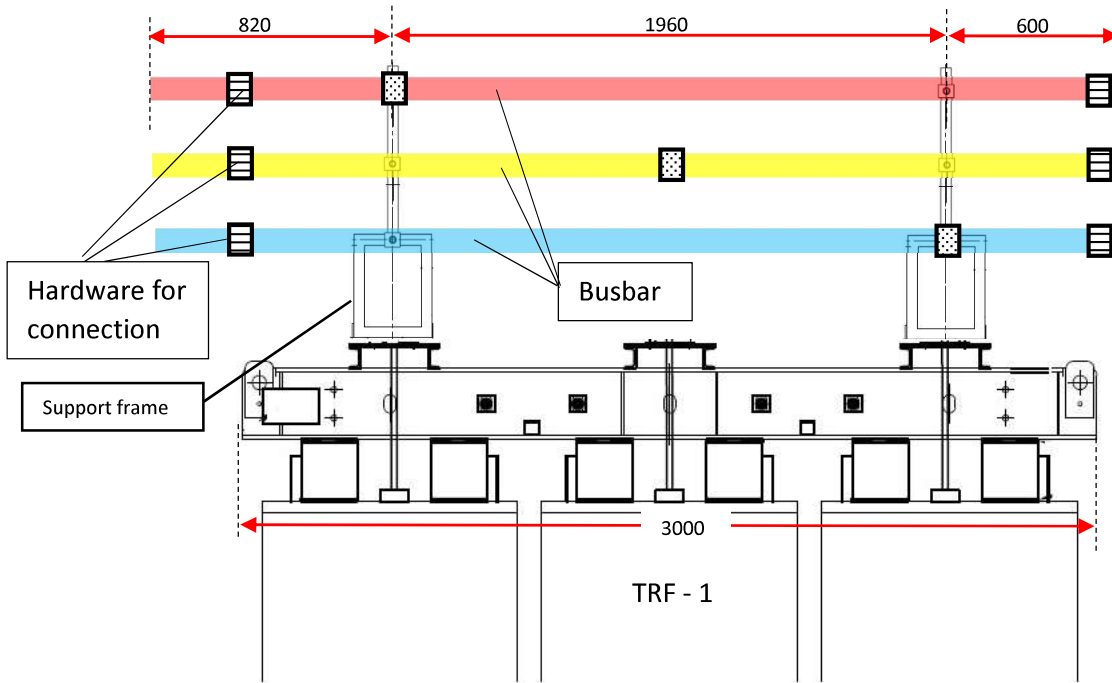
Front view showing busbar layout and mounting detail for TRF -1
